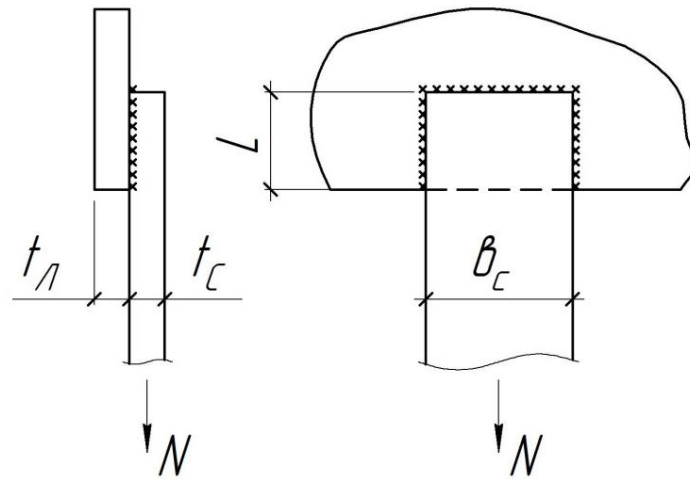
Design of the weld connection, according to subsection 4.2.1
